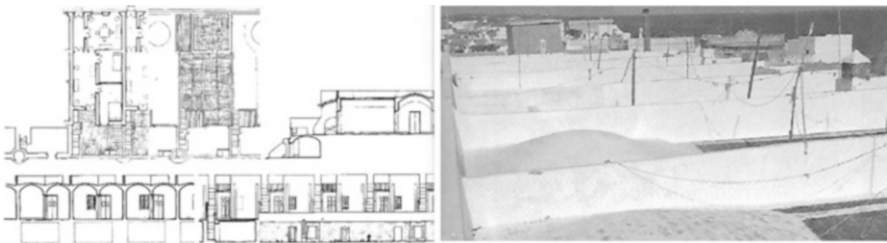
Row houses in Fuzeta, Olhão—plans, sections, elevation, and “Açoteias” (AAP 1961)
